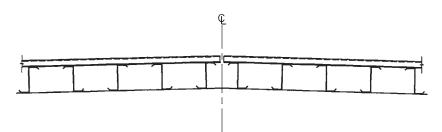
Possible purlin orientation at roofs with slopes less than 1:12.
